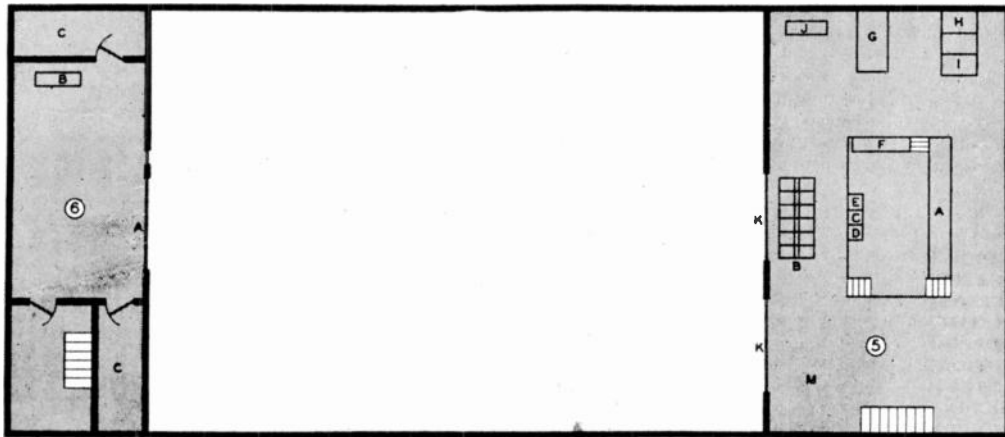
PLAN OF THE SPONSOR'S ROOM, 6, AND THE CONTROL ROOM, 5, AT THE REAR OF THE BUILDING
